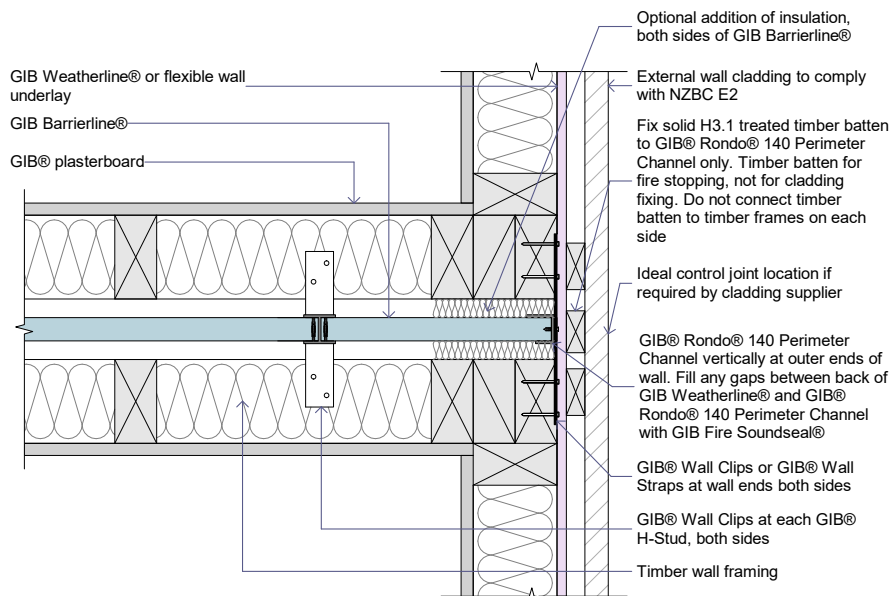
DETAIL AT EXTERNAL BRICK VENEER WALL (WITH GIB WEATHERLINE®)
